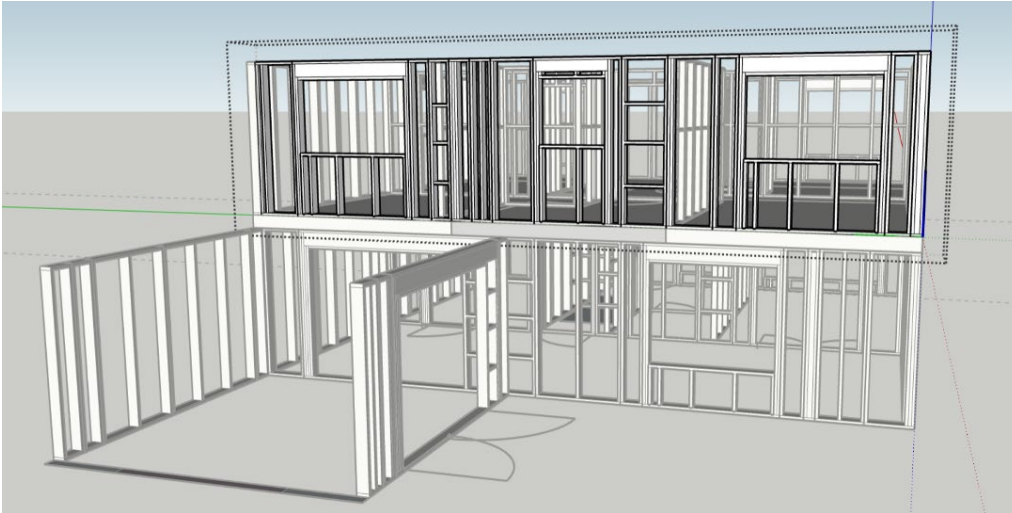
Wall panels inside the building. (Soleplates and headbinders, second floor, roof and cathedral window of garden room not shown.)
